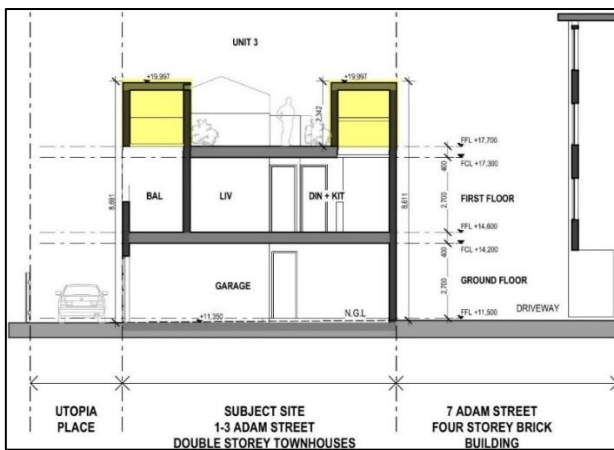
Section showing built-form limiting overlooking from Unit 3 roof terrace
